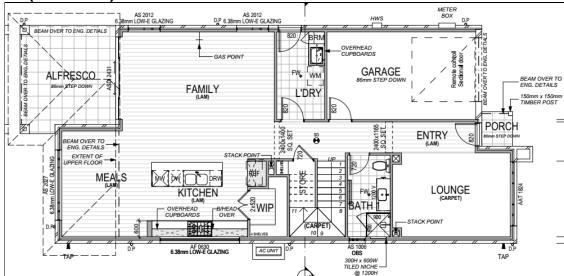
Extract of proposed Lot 1 ground floor. Source: Hall & Hart Homes, 2020
